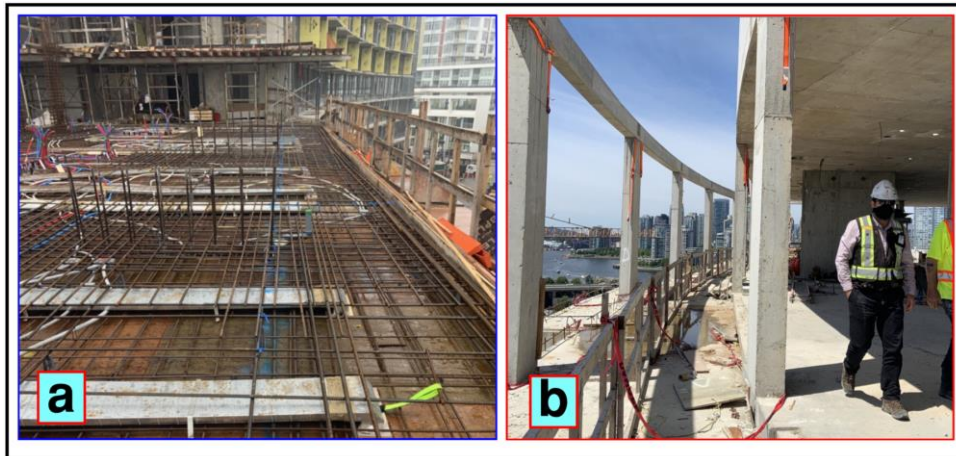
(a) Cast-in-place slab formwork before pouring concrete (b) exposed concrete for as-built monitoring.
